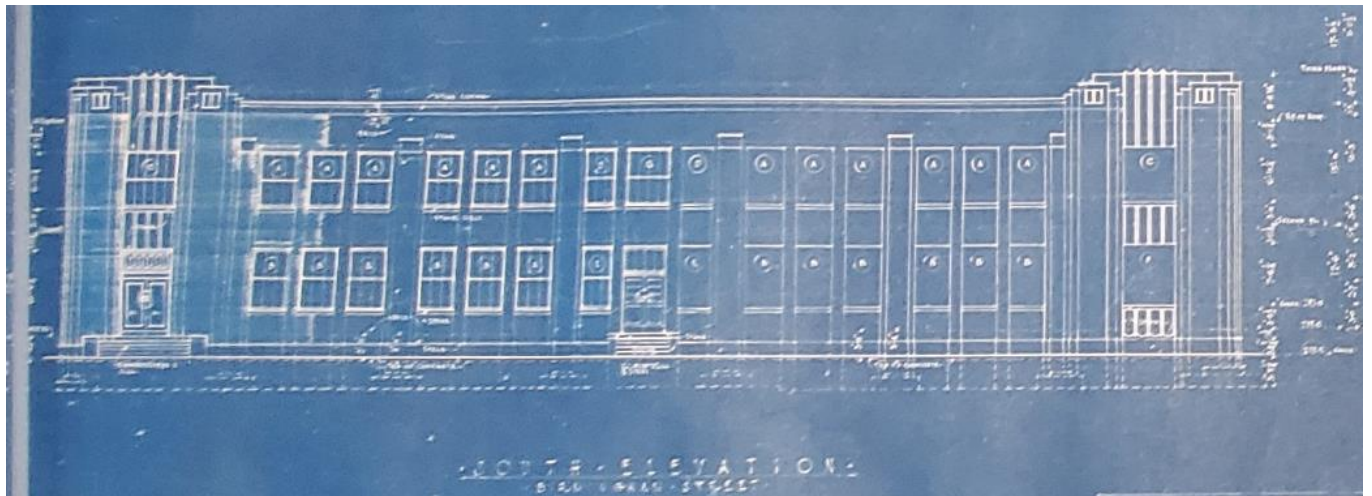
Plan of the principal (south) elevation of the manufacturing building, Mathers & Haldenby, 3 March 1931 (Courtesy of the Archives of Ontario)
